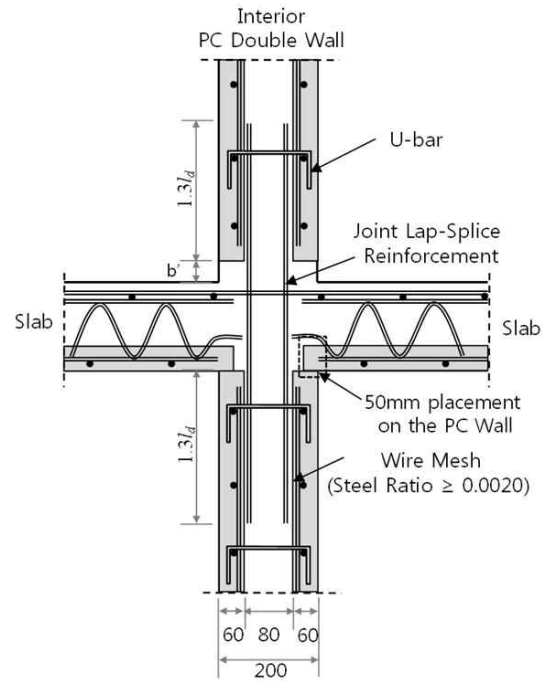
Interior PC double wall-slab Joint (unit:mm)
